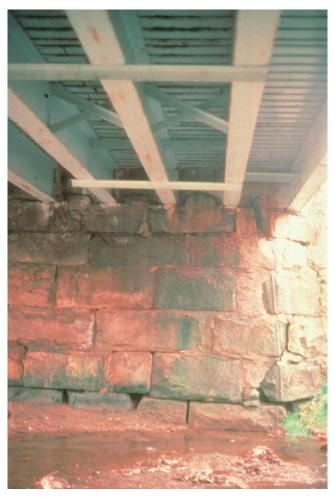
Deteriorated Stone Masonry Abutment
